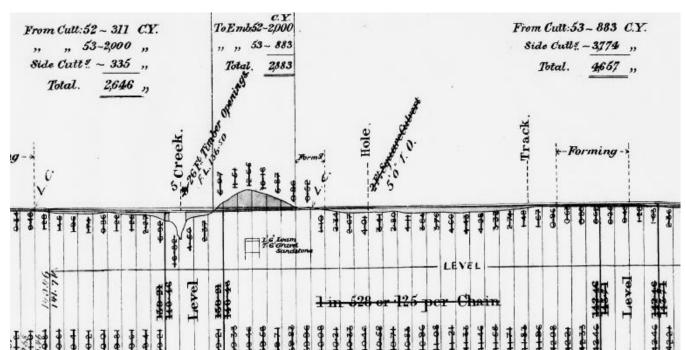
Plan of Great Northern Railway (LPI, Crown Plan Ms 448 Sy R).
